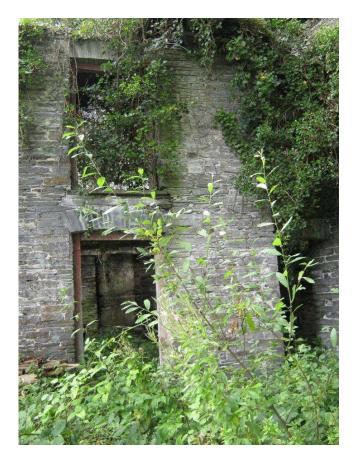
Entrance doorway into Room 3 (right hand side) and doorway into Room 5
